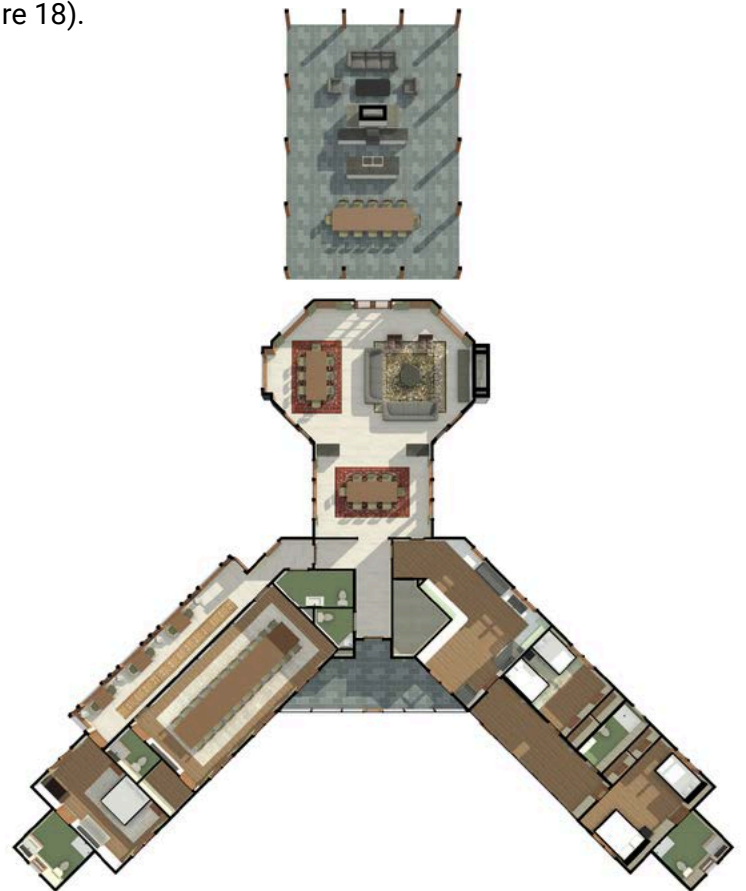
The Lodge seen from above in the new configuration proposed in the Campus Redevelopment scenario. Guest rooms have been converted to a conference room, and a new outdoor living area has been added.
